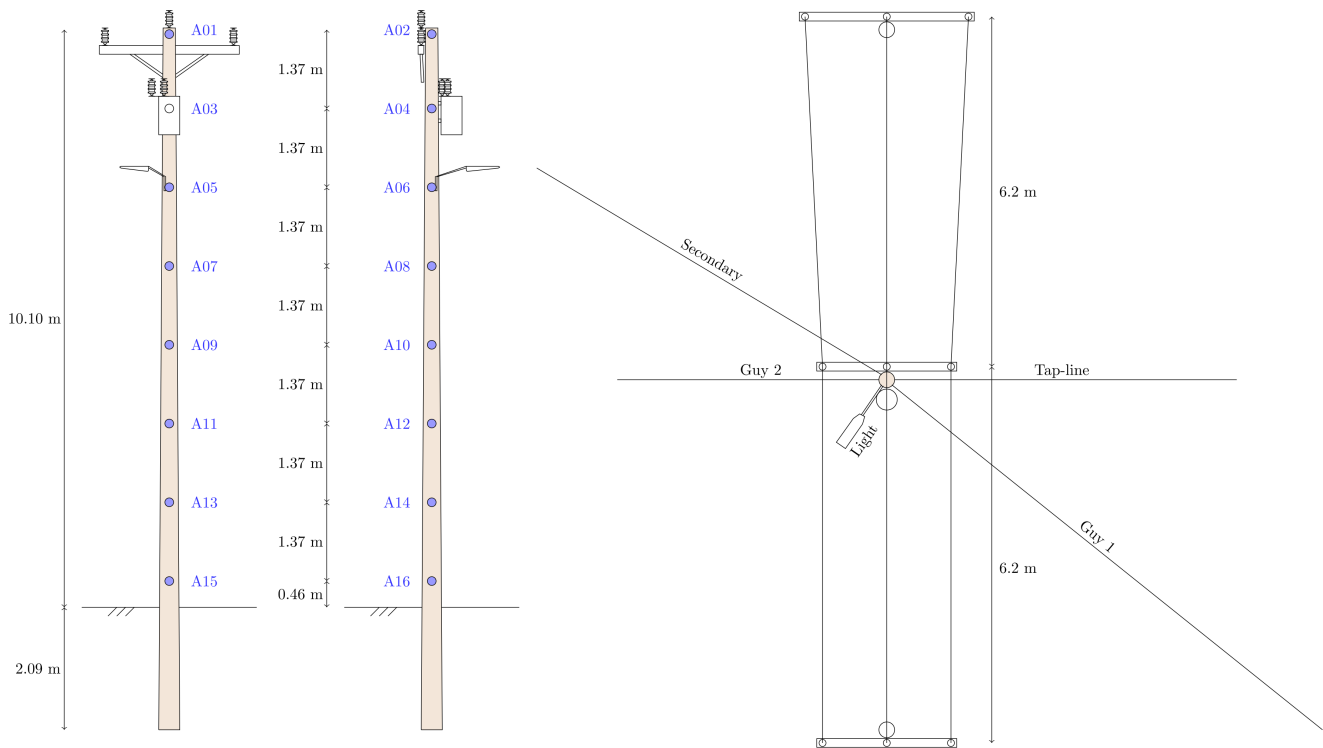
Elevation and plan views of the pole configuration with locations of accelerometers denoted
